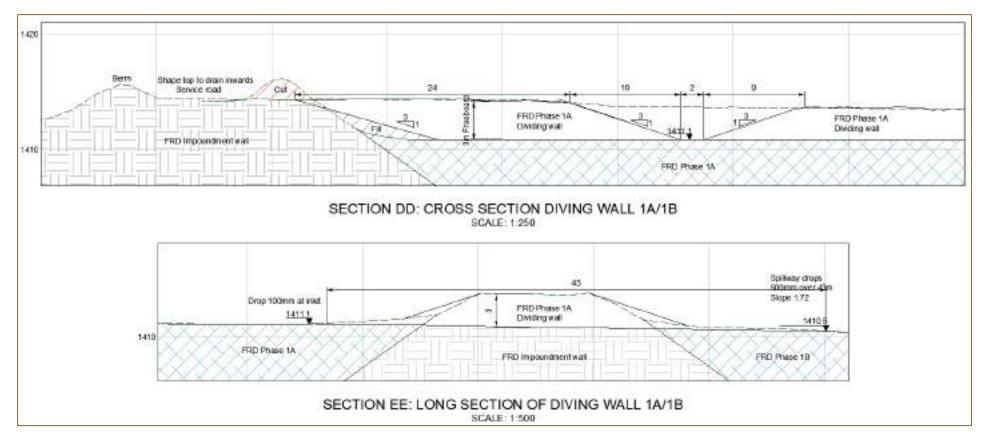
FRD: Typical sections of diving wall between FRD 1A & FRD 1B
